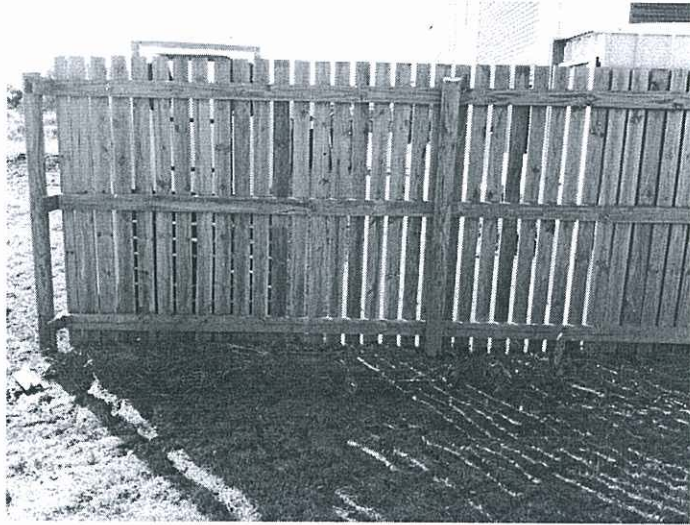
Lawful Point of Discharge - Stormwater Drainage Easement
